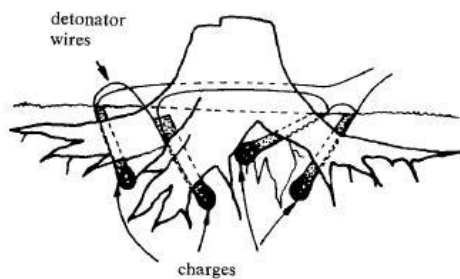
Typical charge placement for large tree stumps with large lateral root system.
